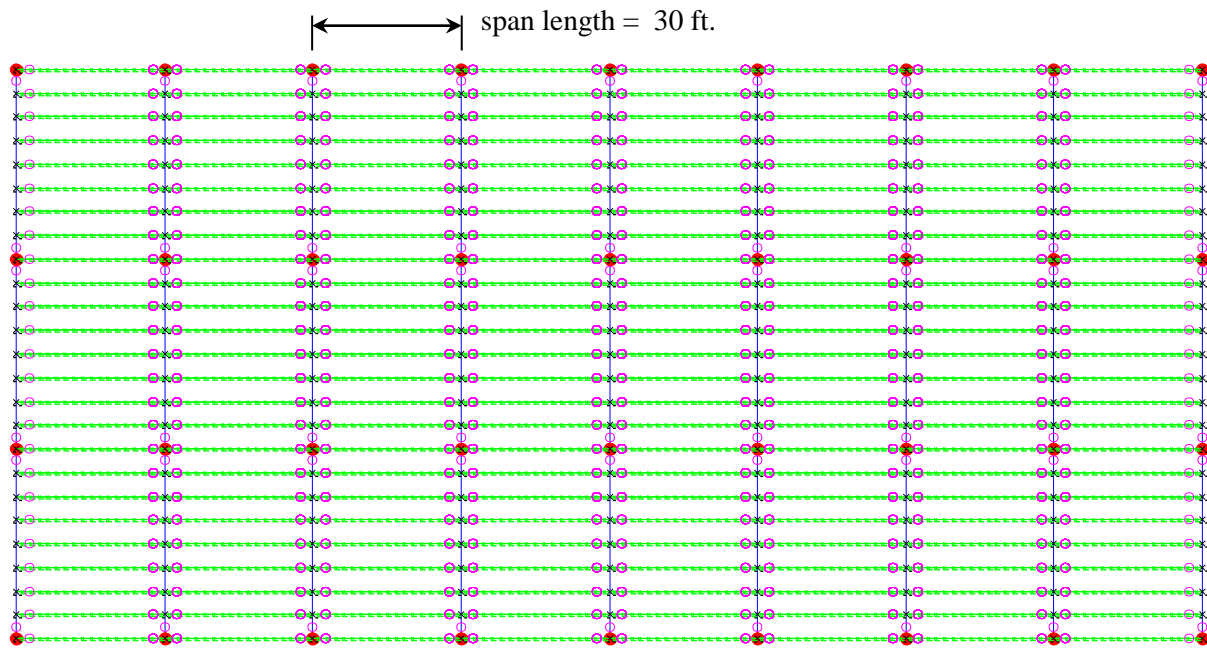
Plan view of building models with 3 bays along the width and 8 bays along the length.
